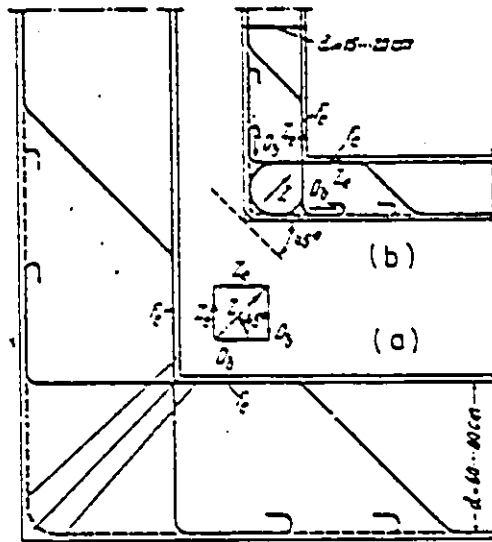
STANDARD CORNER LAYOUT RECOMMENDED IN GERMAN BUILDING CODE (Ref. 11)
